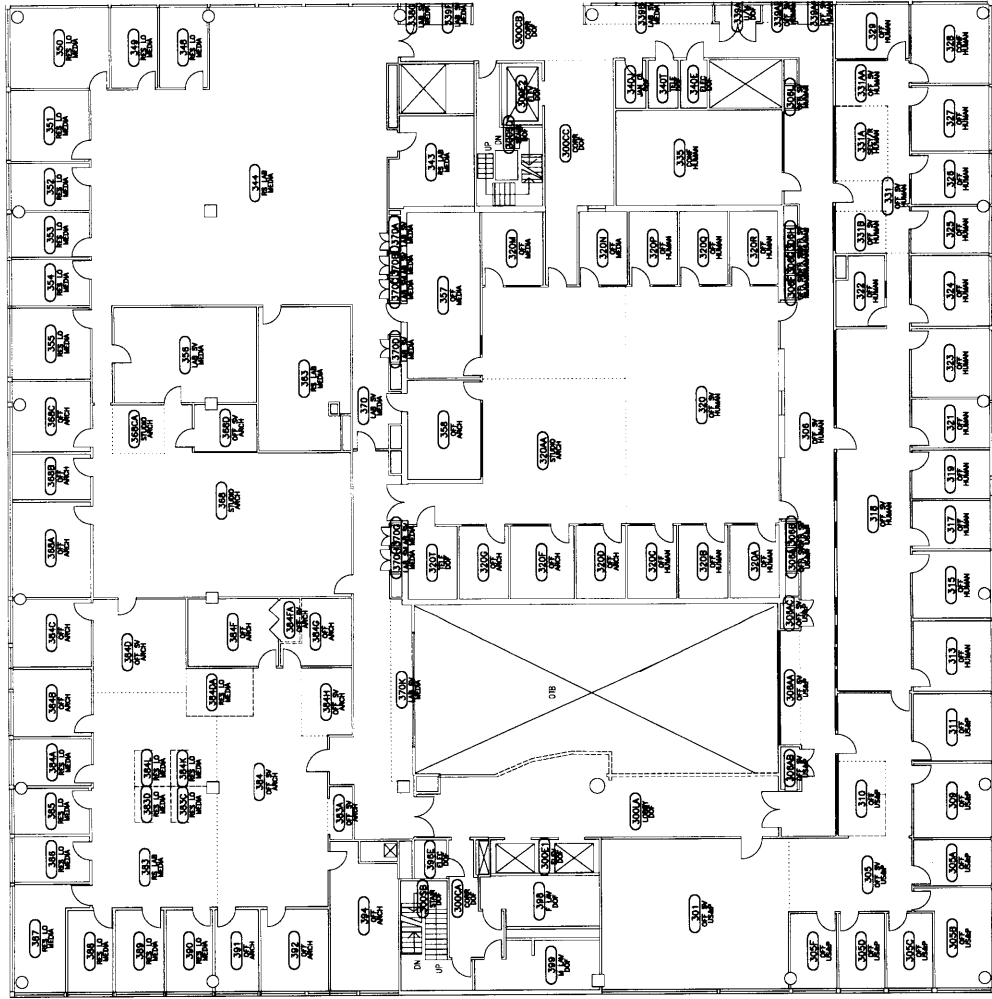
Floorplan of the Third Floor of the Media Lab at MIT.
